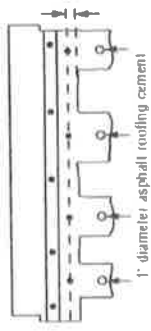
Fastening Presidential and Presidential TL Shake shingles on steep slopes.
